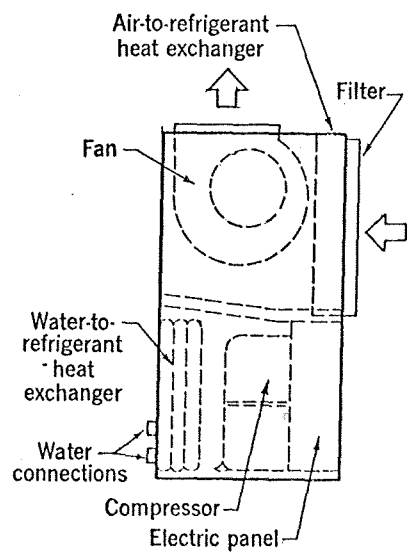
Vertical single package water-to-air heat pump typical of type used for apartment house application.
